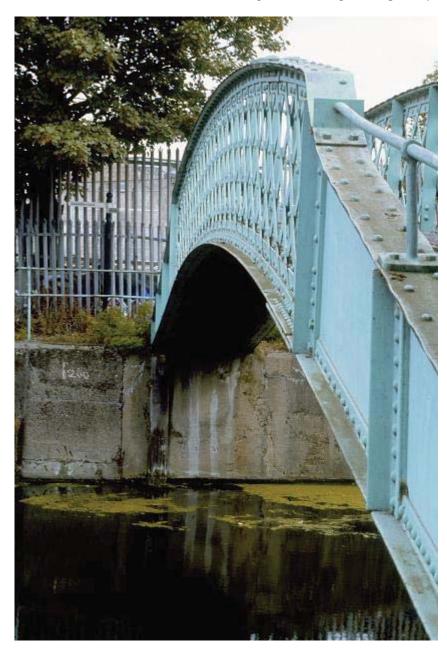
View of northern side of City Mill River Footbridge and anchorage in concrete wall, looking north-east: OL-03507
